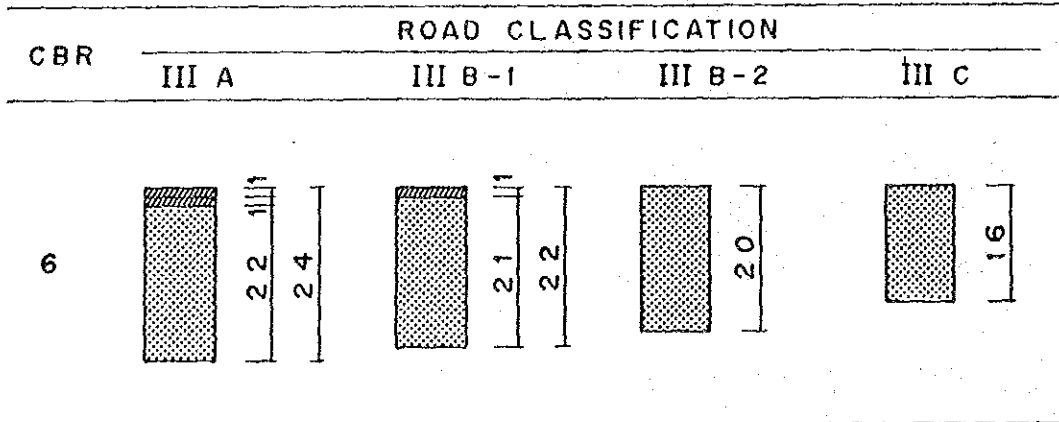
shows the standard pavement structures adopted for the Project, and Fig. 5-2-2 shows the case where cement stabilization base course is used.
